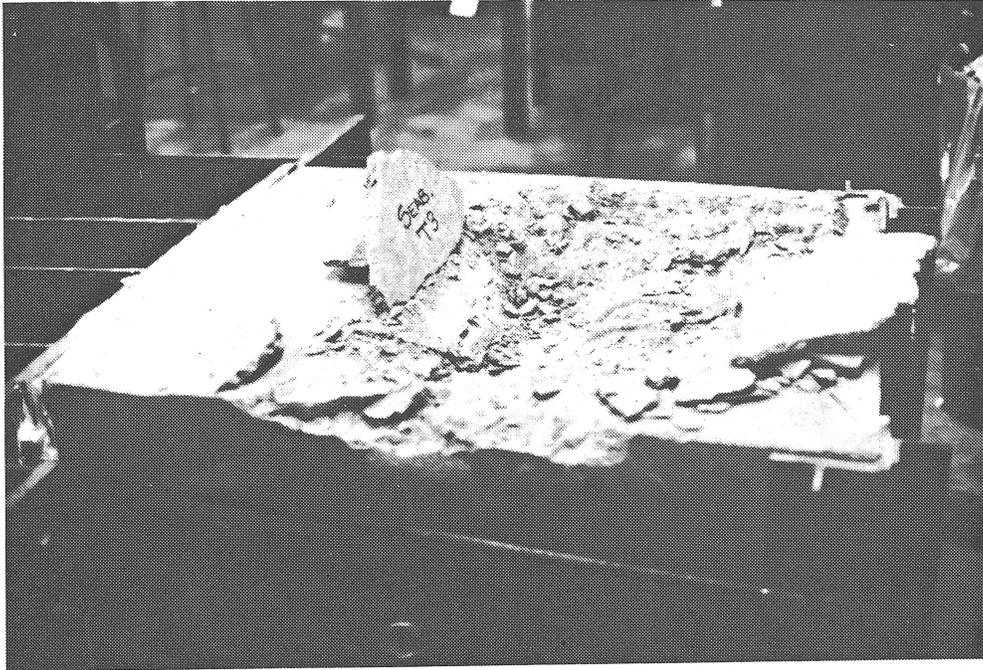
Specimen T-3. Concrete Surface After Removal of Liner Plate
